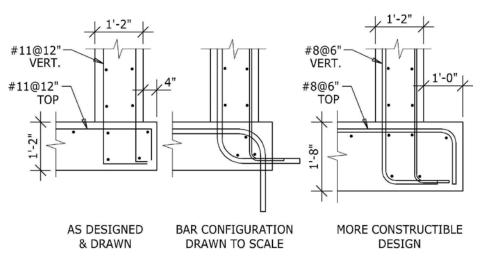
Insufficient footing dimensions to install and develop reinforcing steel.
